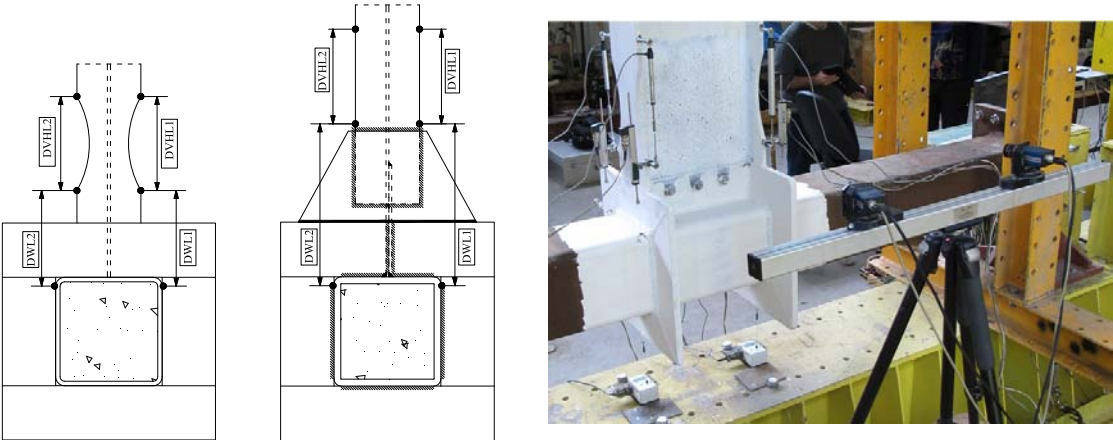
Instrumentation of joint, and connection zone prepared by whitewashing.
